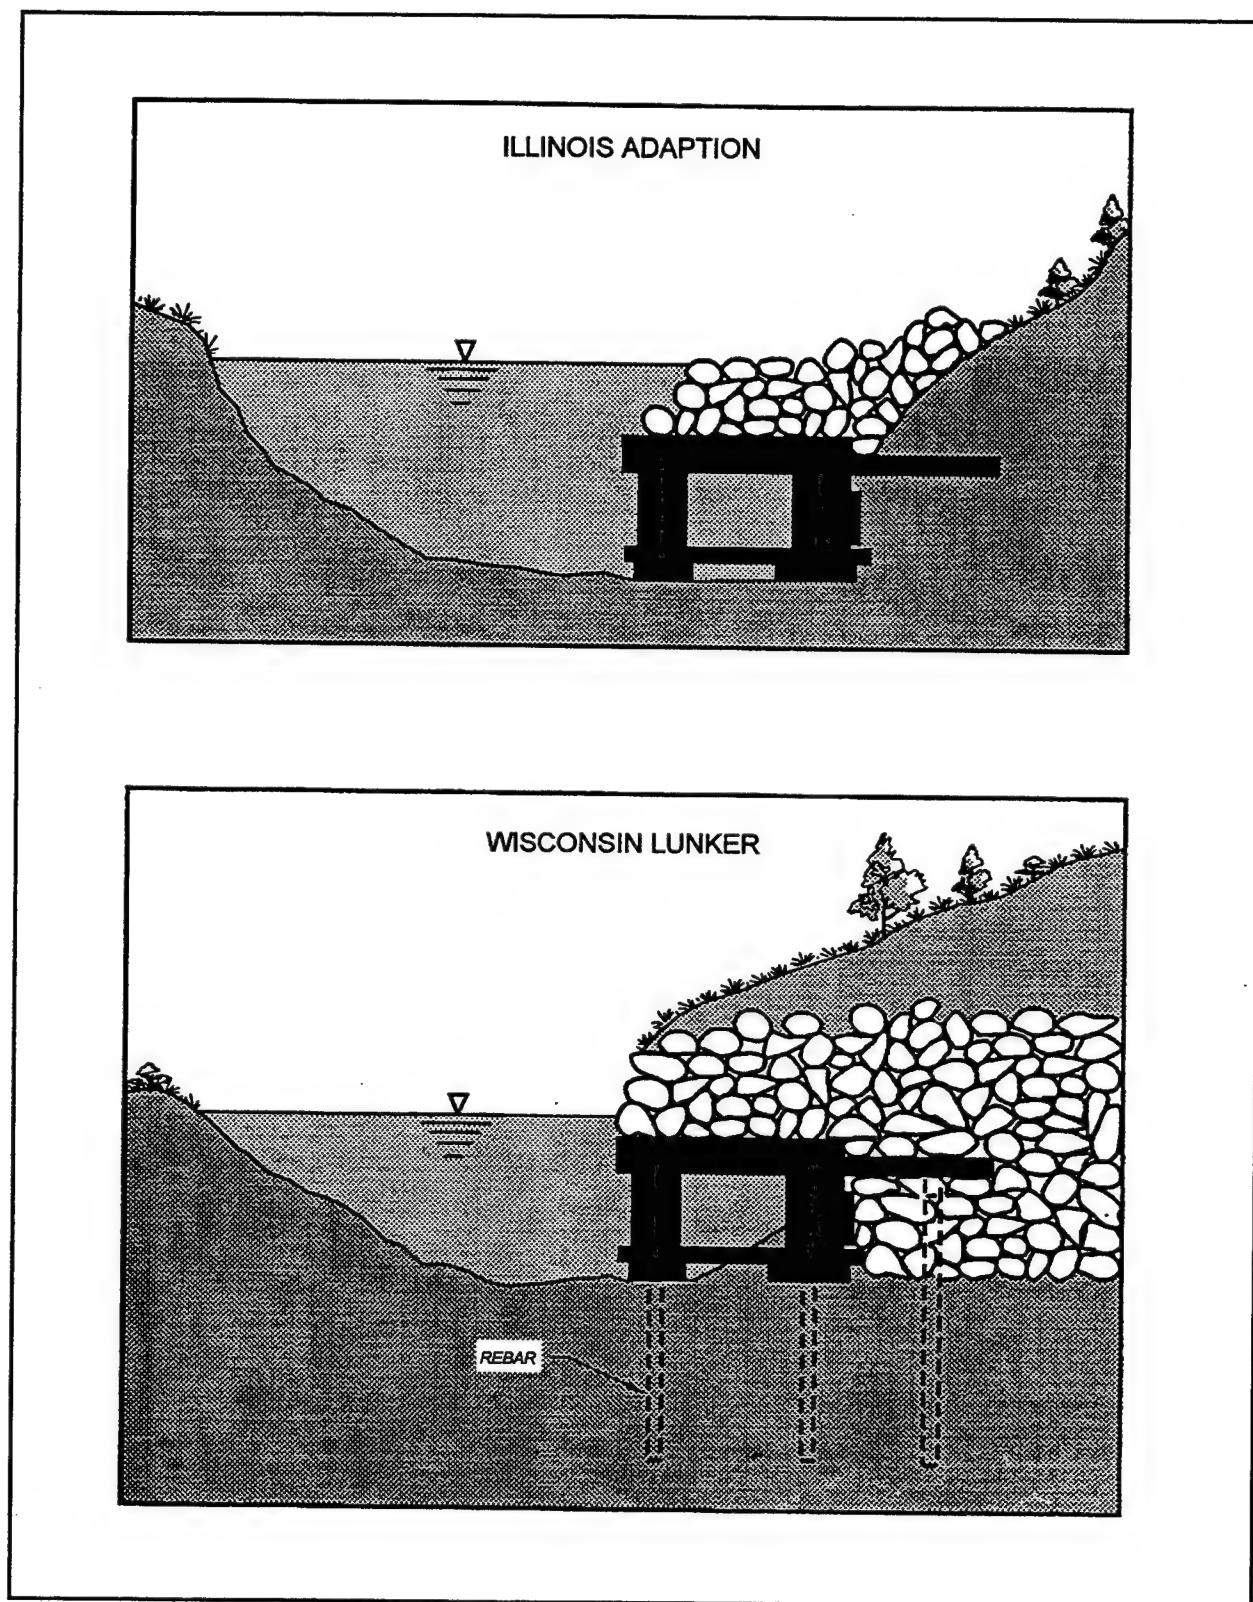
Two schematics (two versions) of a LUNKERS structure designed to provide overhanging shade and protection for fish while serving to stabilize toe of a streambank (Both versions use rebar although rebar is not shown on the upper schematic)
